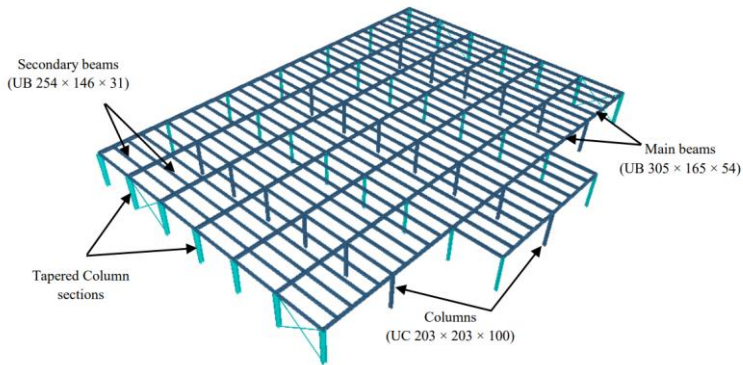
Isomeric 3D rendered view of the mezzanine floor
